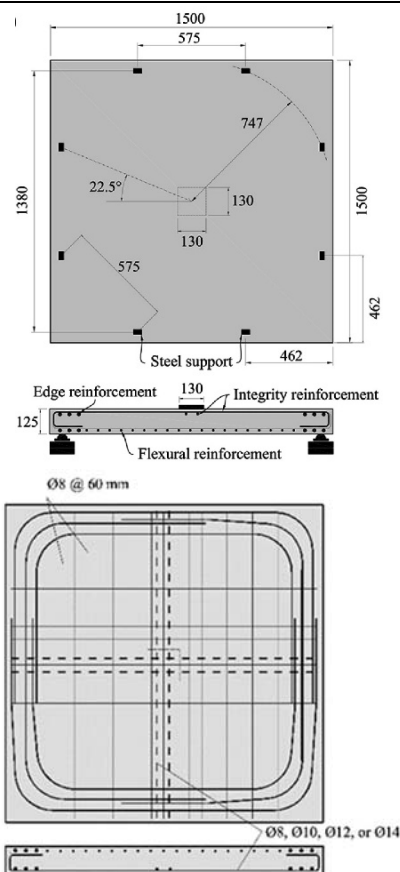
(a) Geometry of test specimens; (b) reinforcement layout [6]
